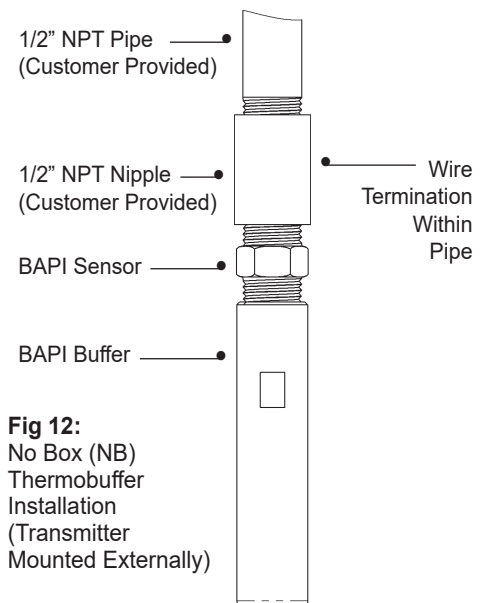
No Box (NB) Thermbuffer Installation (Transmitter Mounted Externally)
